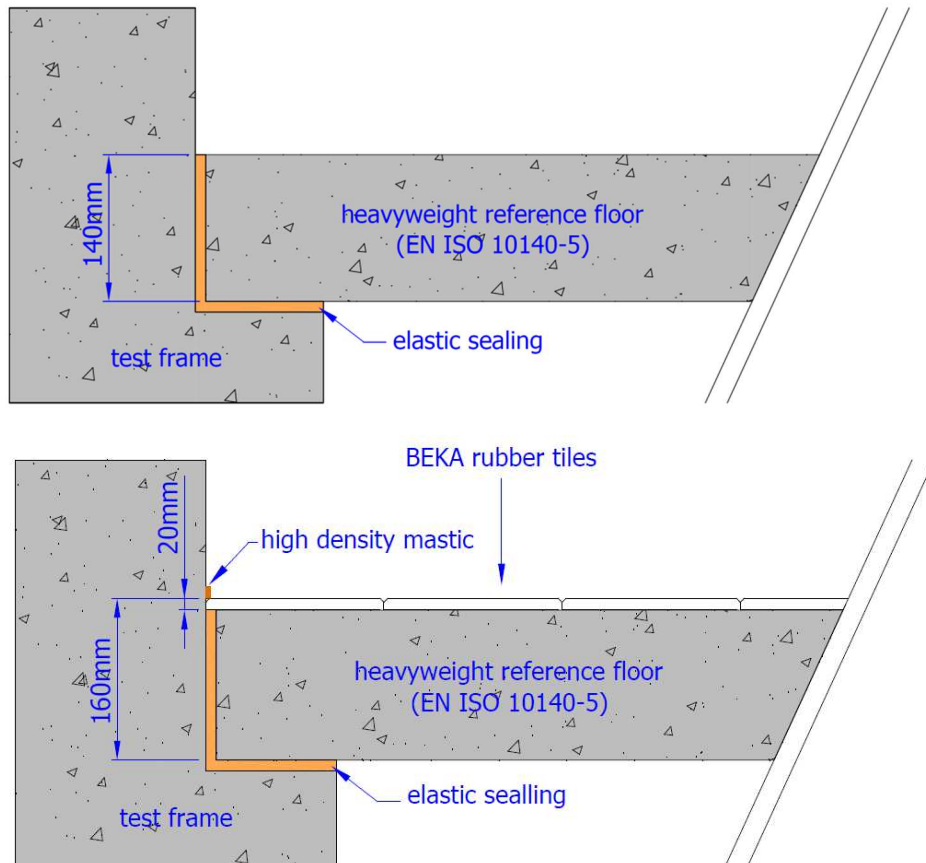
to 12 Installation and sealing of the floor covering on the reference floor
